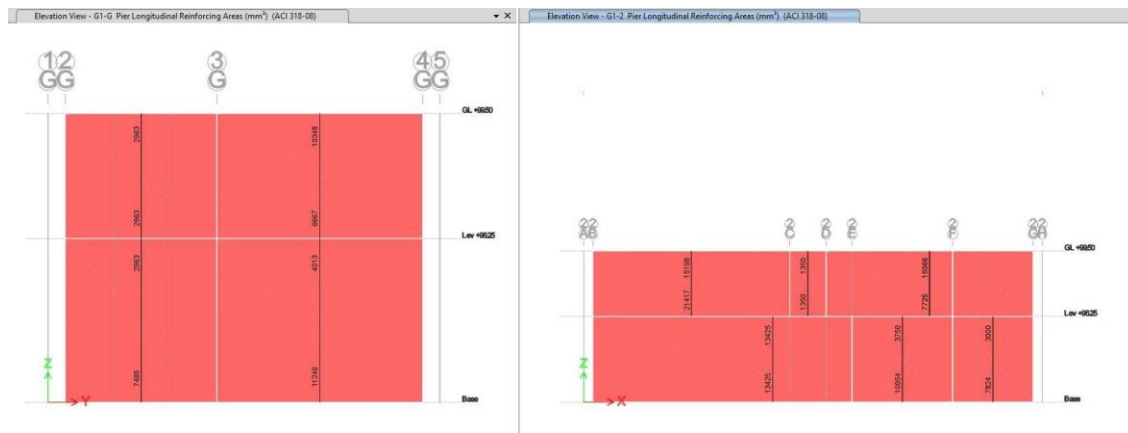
Pier Longitudinal Reinforcing Detail of Exterior Wall (mm²)
